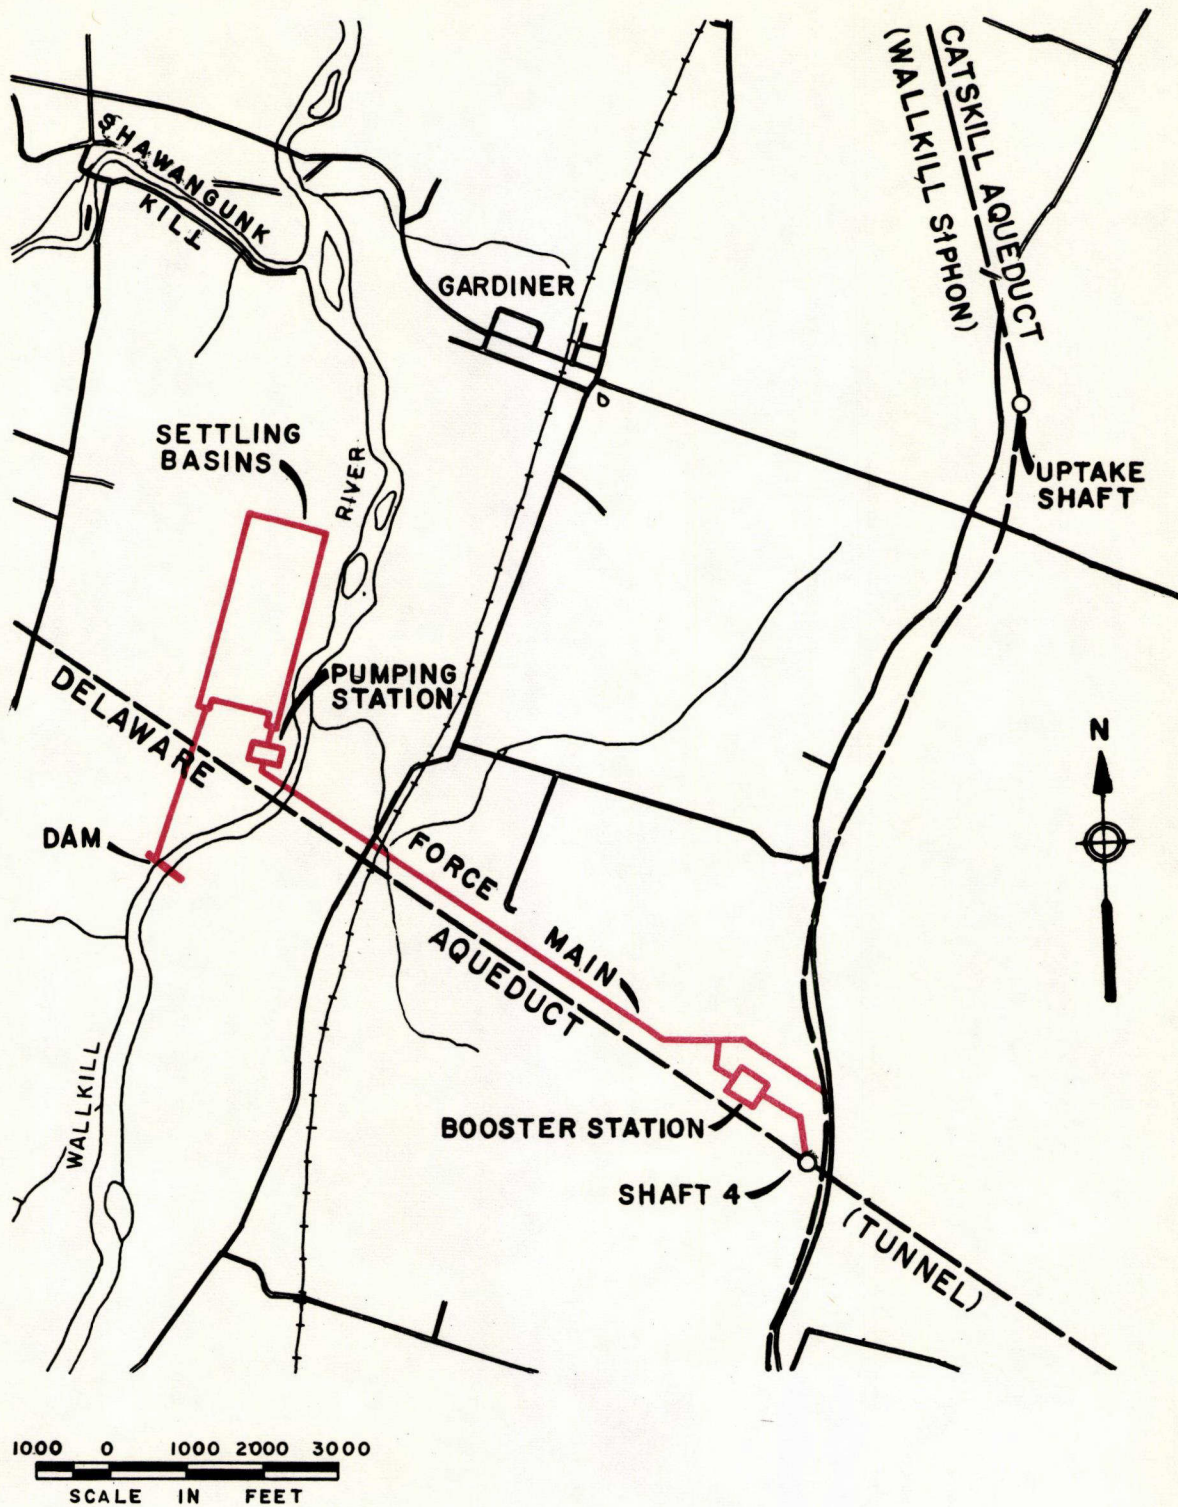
WALLKILL FLOOD SKIMMING PROJECT
